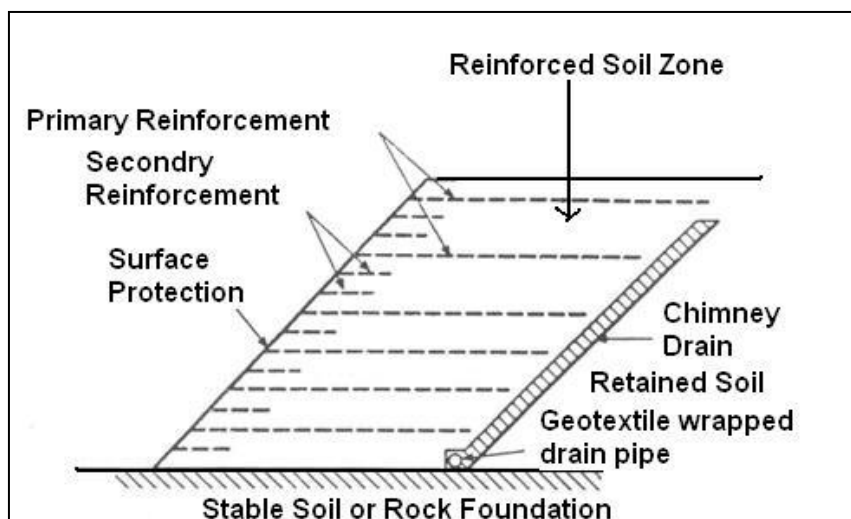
Components of Reinforced Steepened Slope System (RSS)
